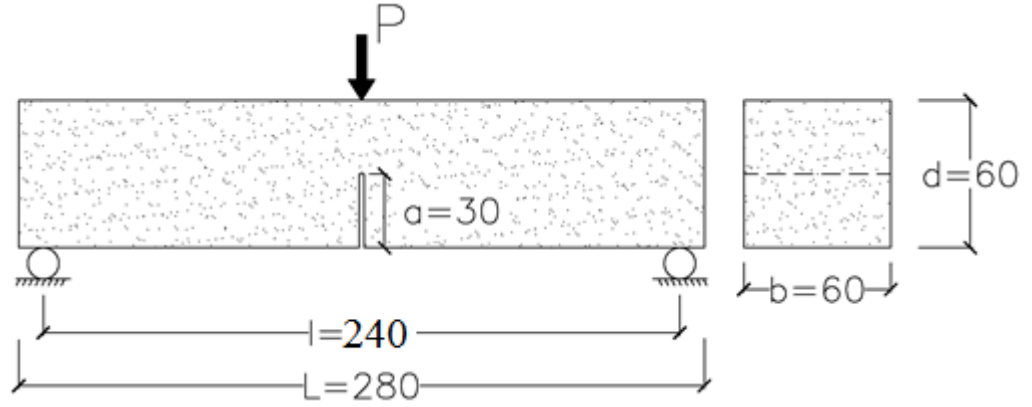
Schematic matrix fracture toughness test setup (all dimensions in mm)
